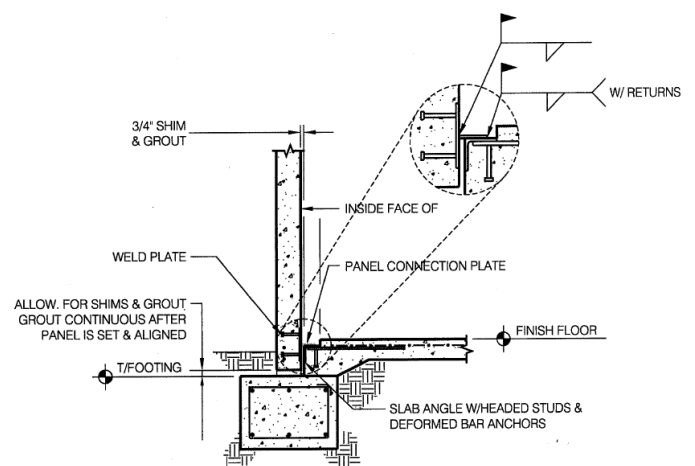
Welded Foundation Connection (Ward)
